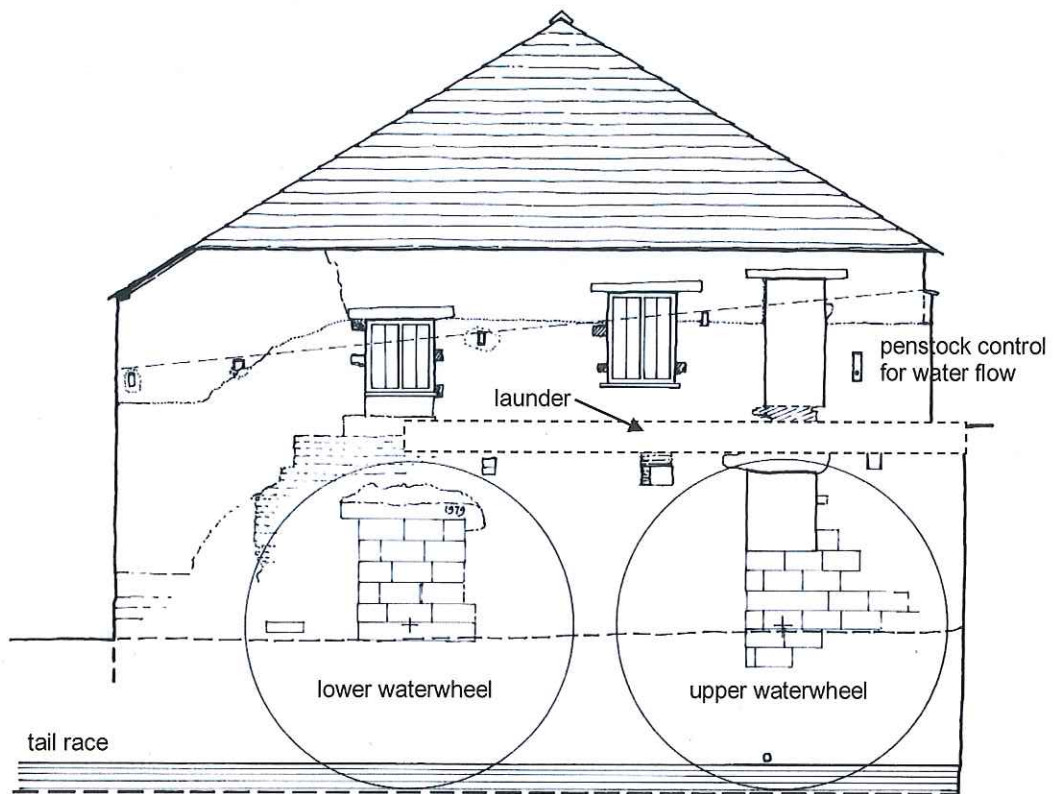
Lew Mill. West (wheelpit) elevation, showing positions of waterwheels
